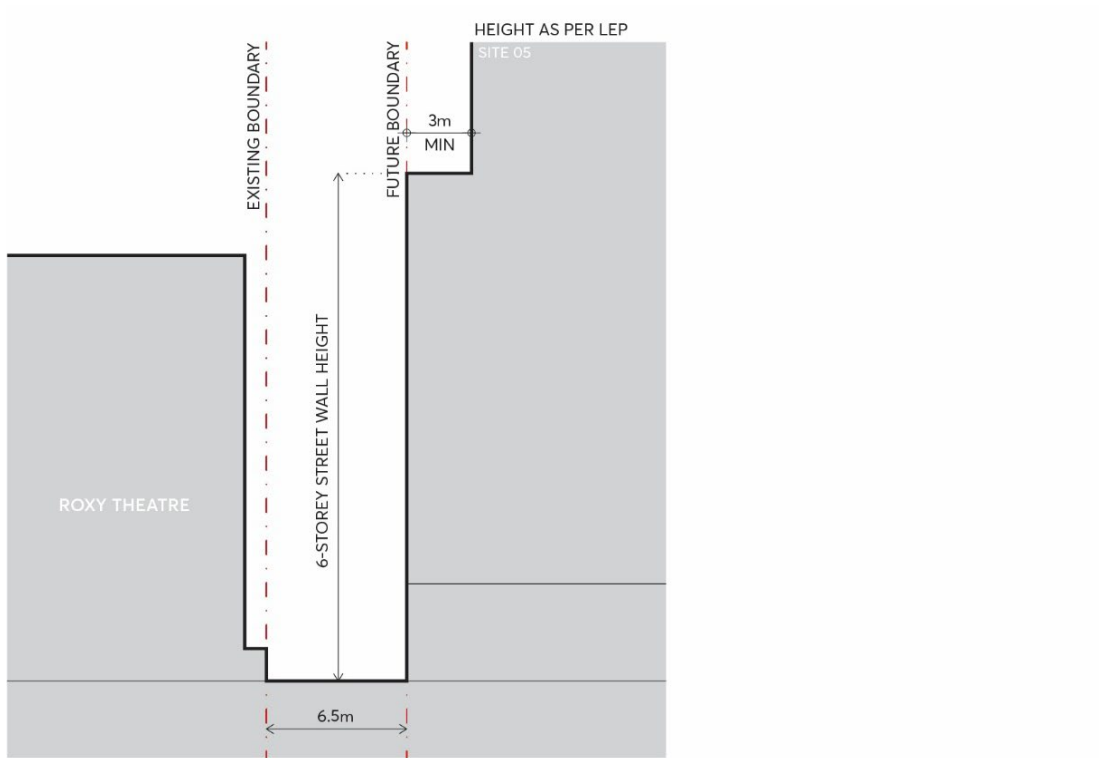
New Laneway between the Roxy and Site 05 (Section F)
